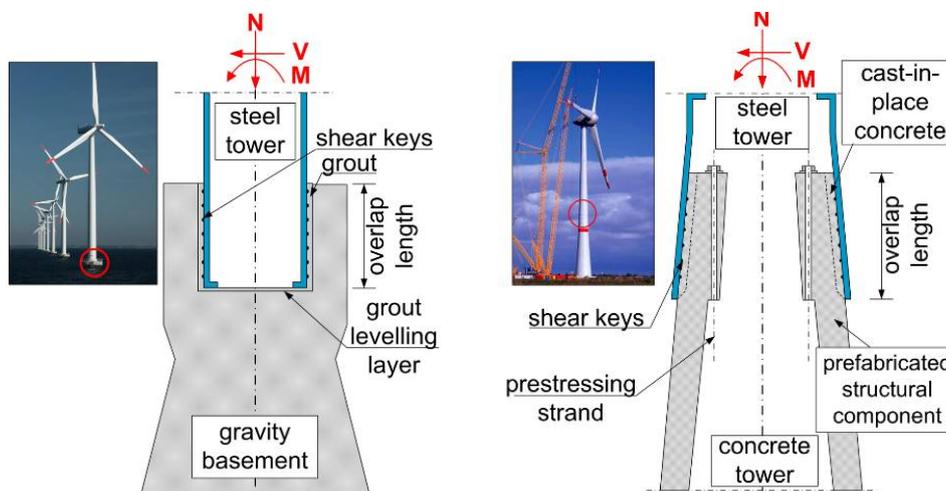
Grouted connection for gravity basements (left) and for onshore hybrid towers (right)
